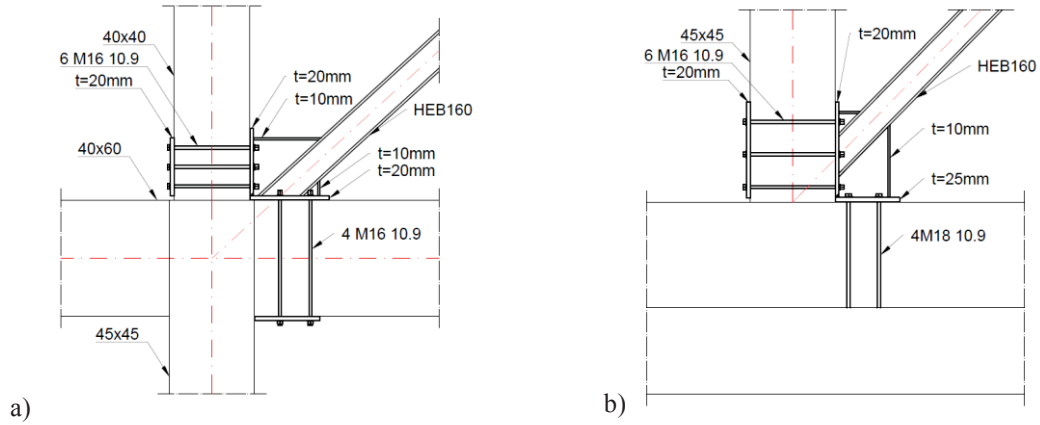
Brace to frame connections: (a) at a beam to column joint, (b) at a foundation beam joint.
